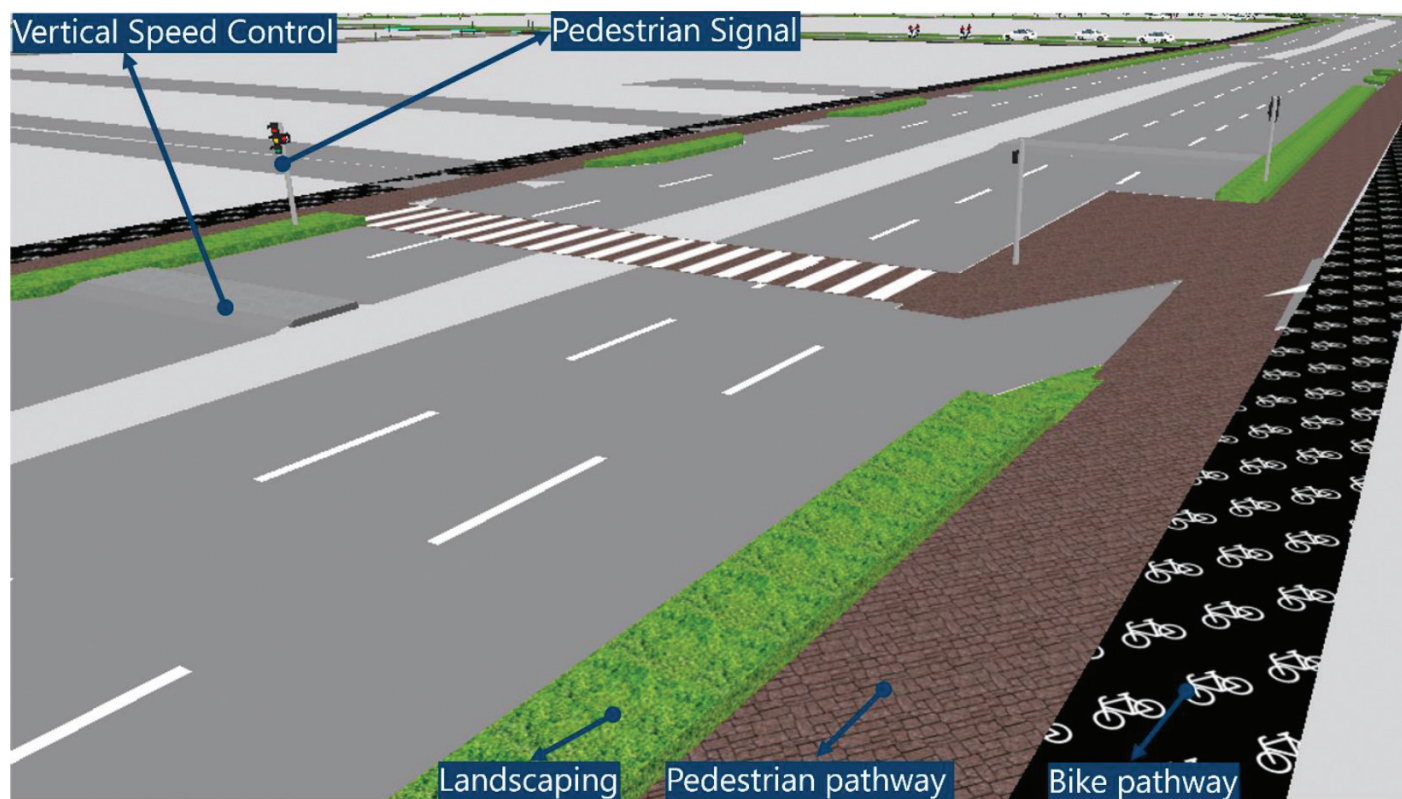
Scenario 1 - Pengkalan weld
